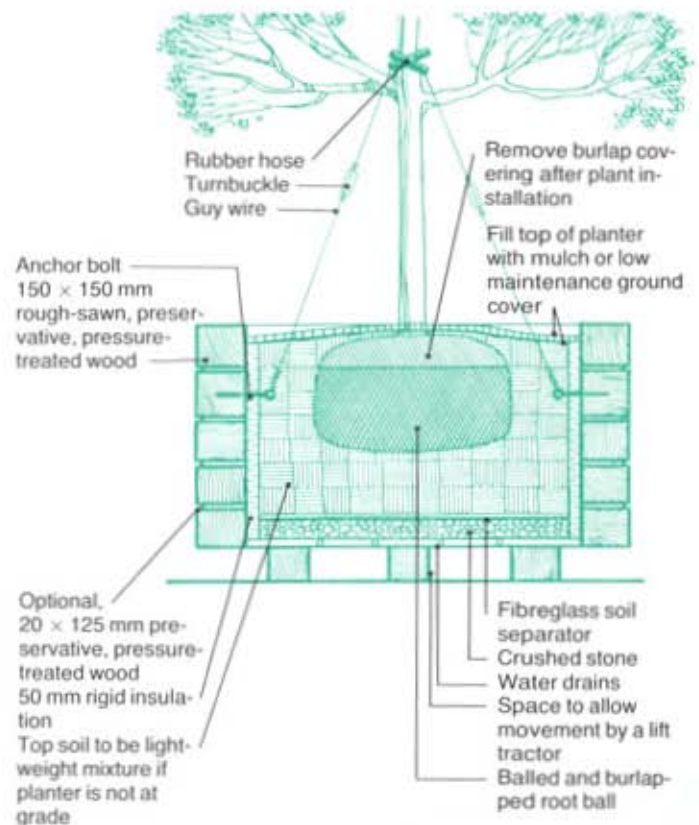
If this typical wood planter is placed over a heated building or garage, 75 mm of rigid insulation should be included between the soil separator and the gravel.
